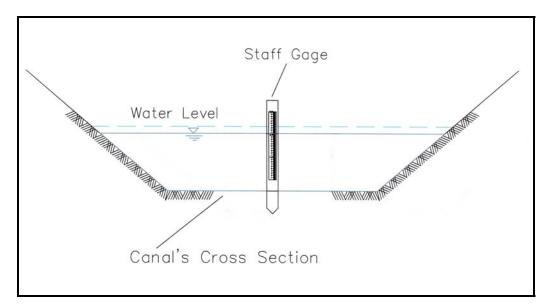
Schematic Cross-Section of a Typical Ponding Method Test Section
